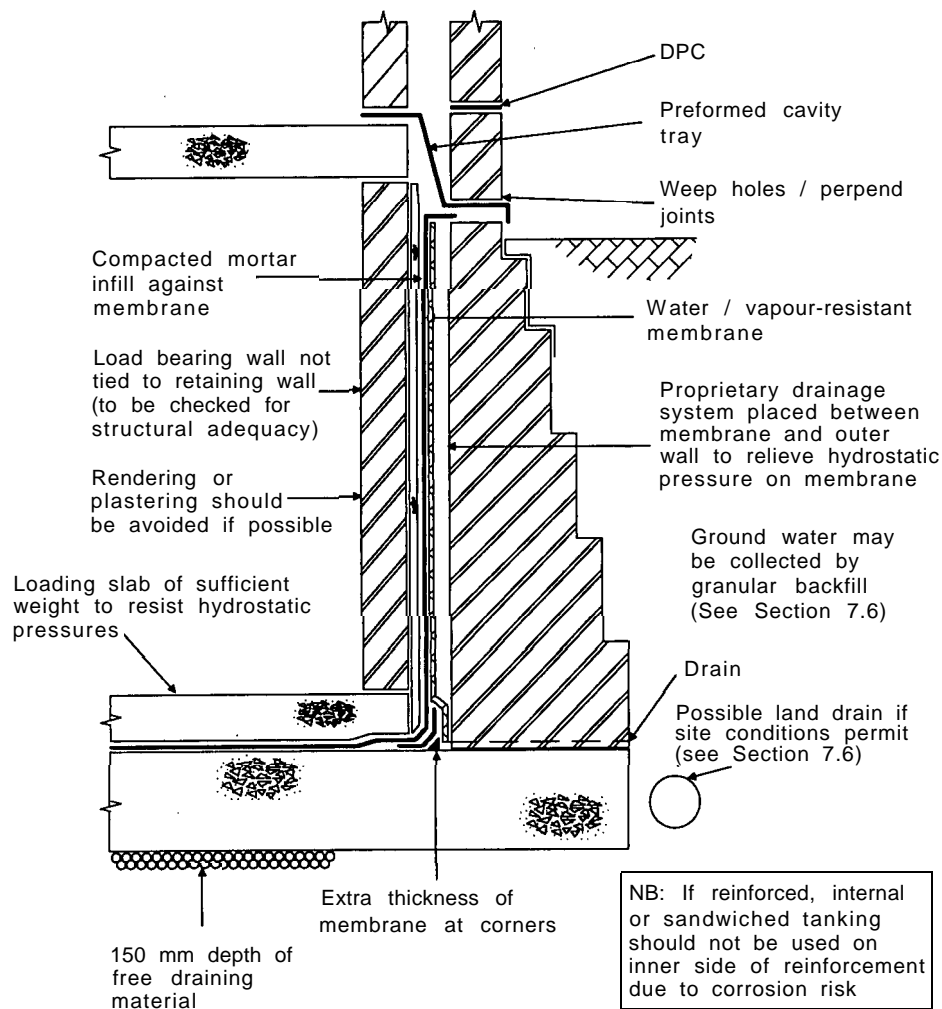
Masonry structure with sandwiched tanking (Type As)
